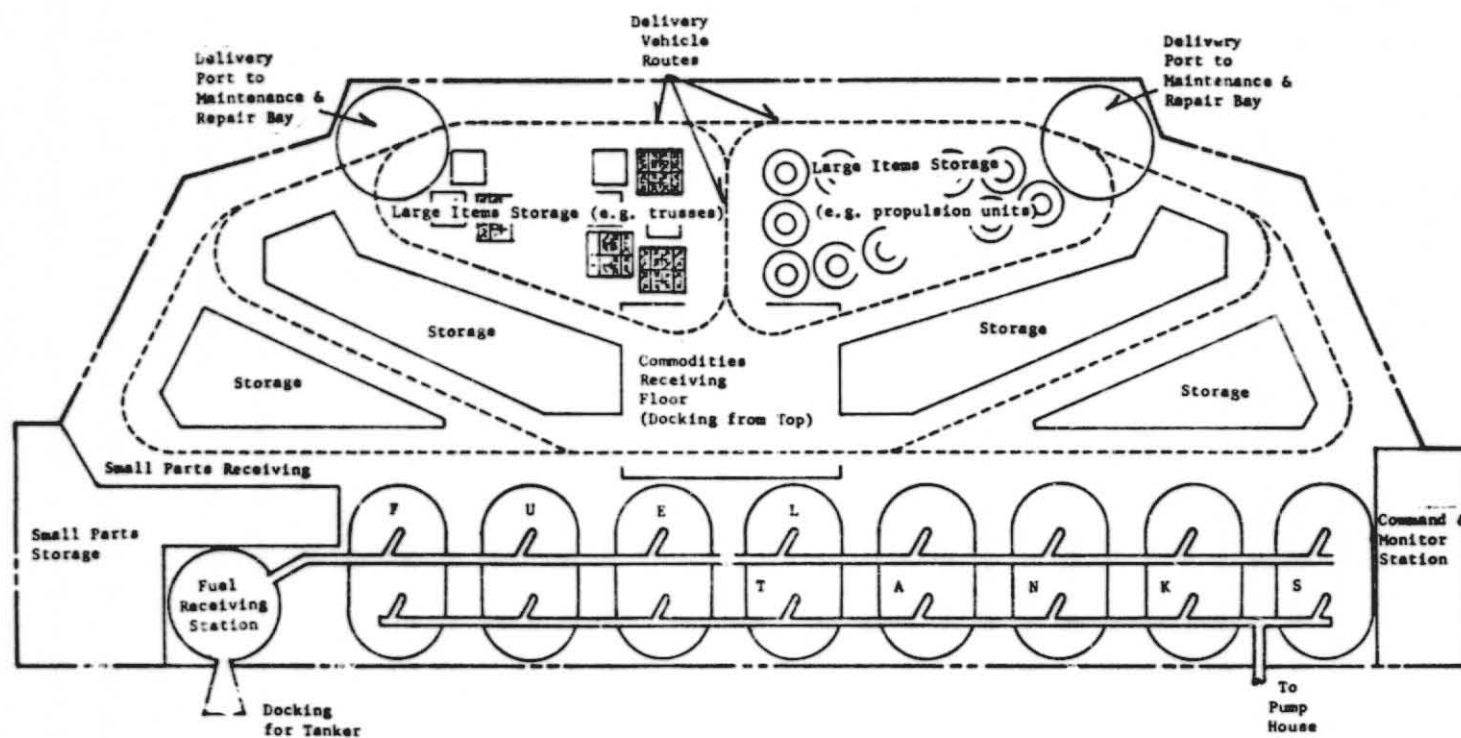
CSF/MRM Typical Floor Plan
